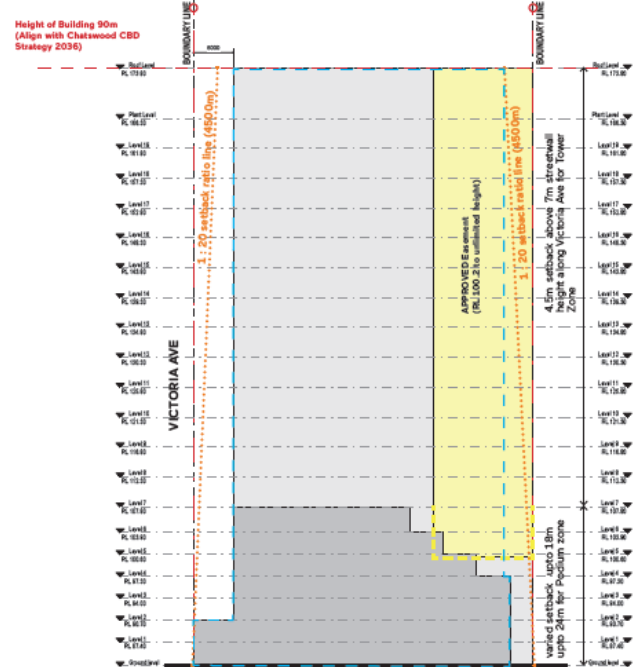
Proposed concept north-south section (source: APlus Design Group)
